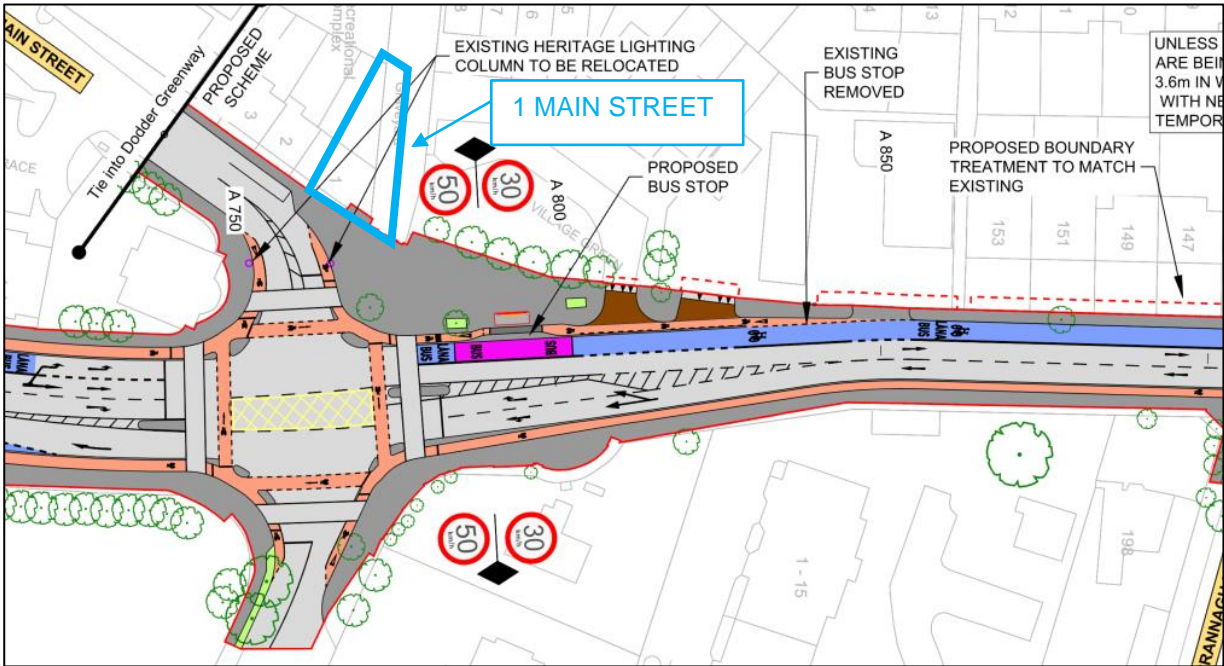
General Arrangement of Proposed Scheme adjacent to 1 Main Street (Sheet 03)
